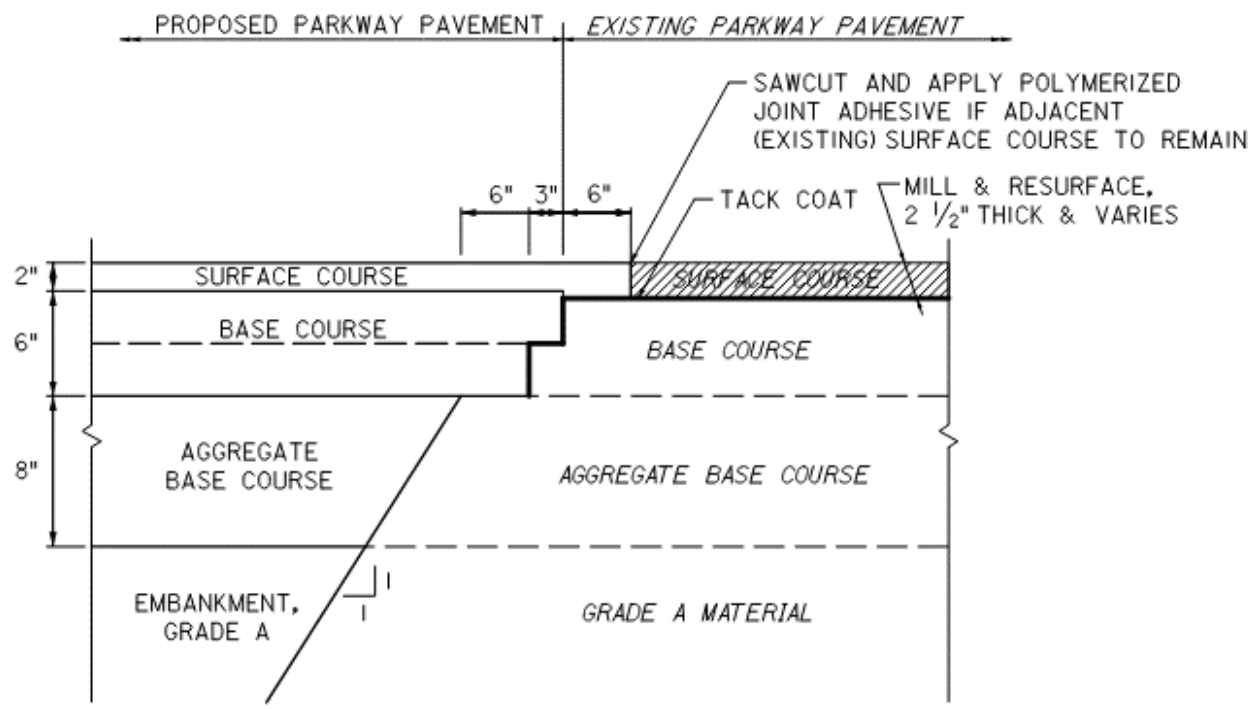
Parkway Toll Plaza-Transverse/Longitudinal Paving Interface
